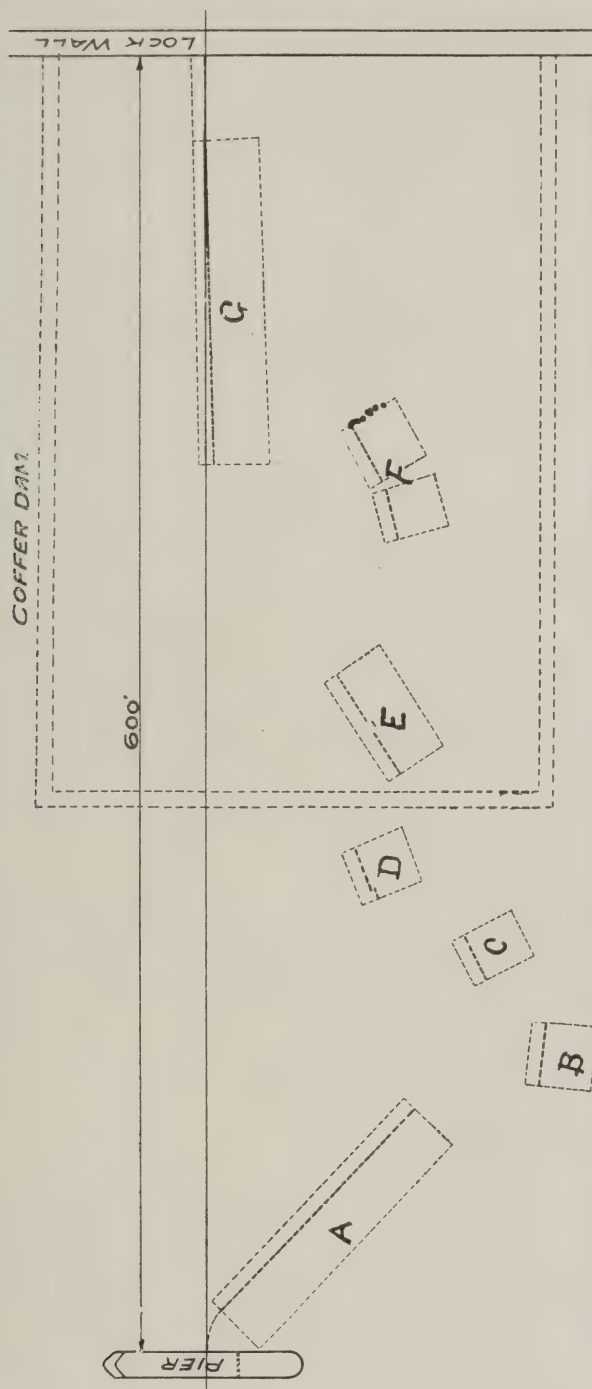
Ohio River Lock and Dam No. 26. Position of foundation of the navigable pass after failure, August 8, 1912.
